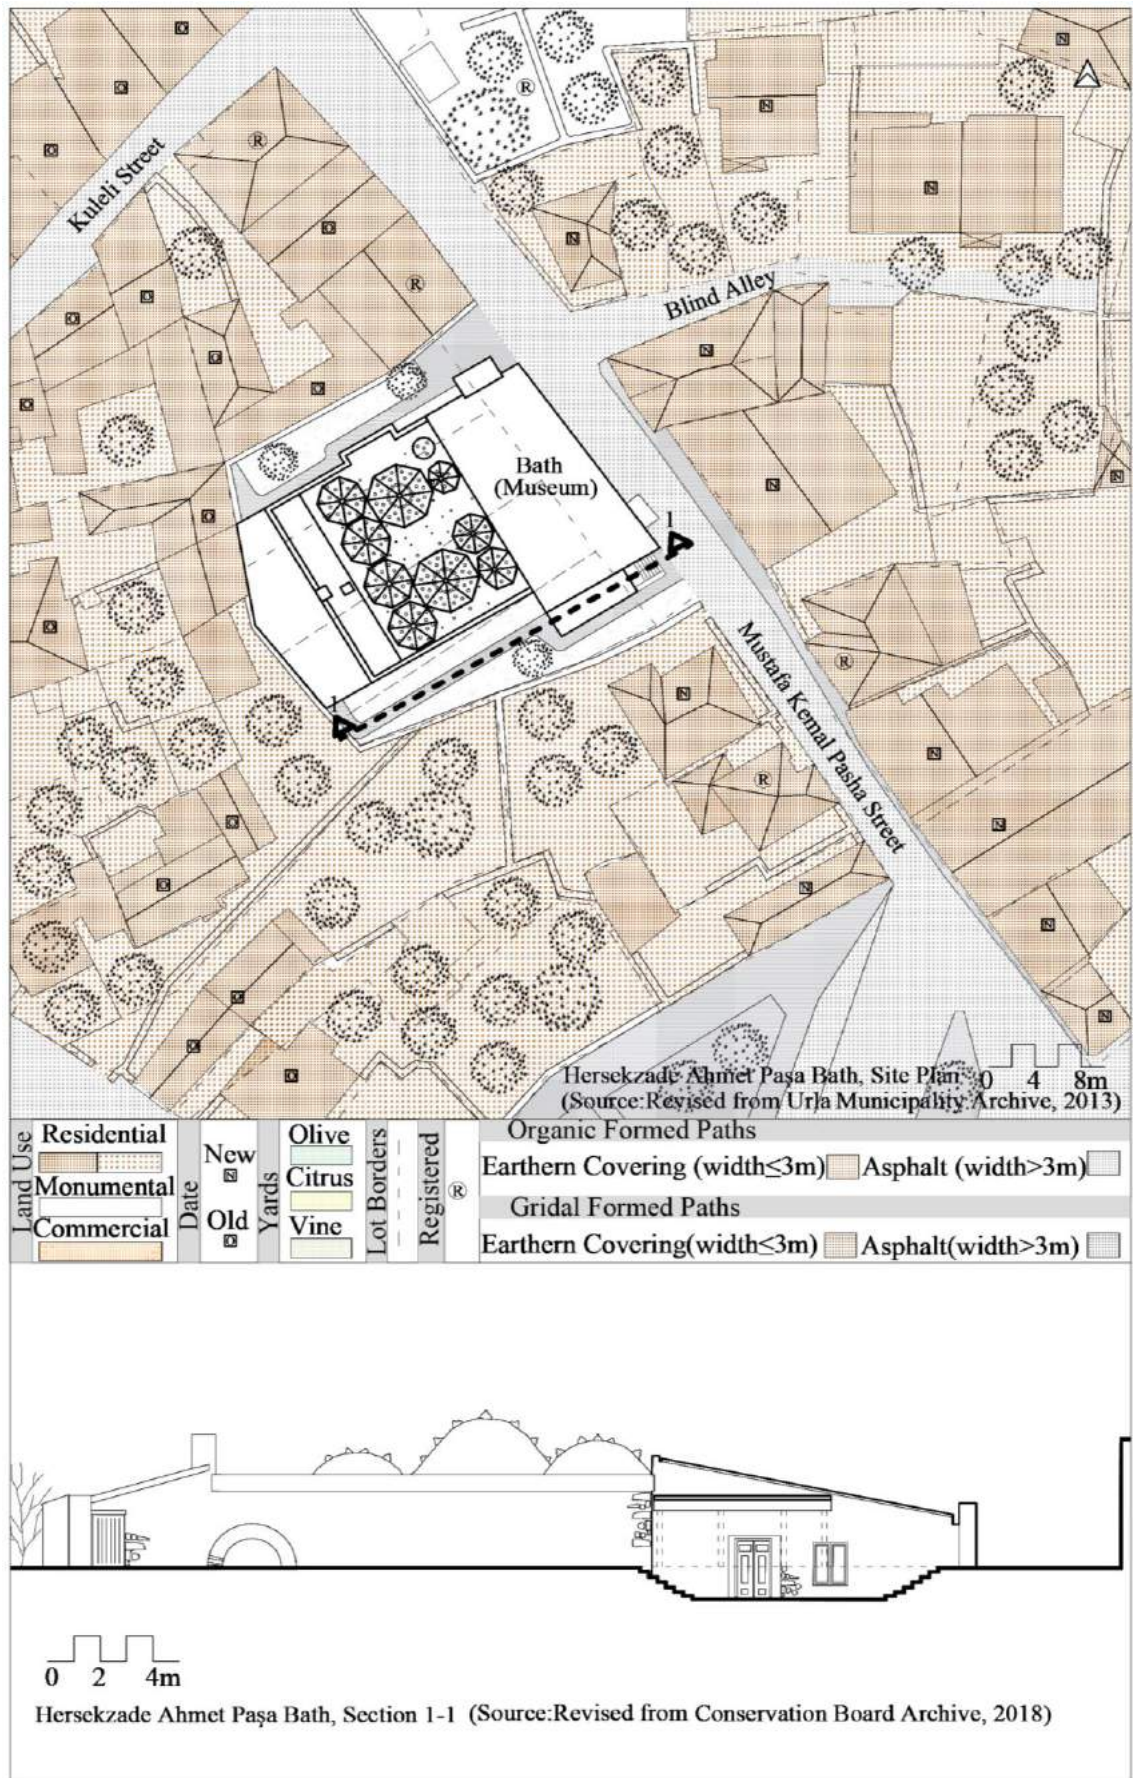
Site plan and section, Hersekzade Ahmet Paşa Bath
